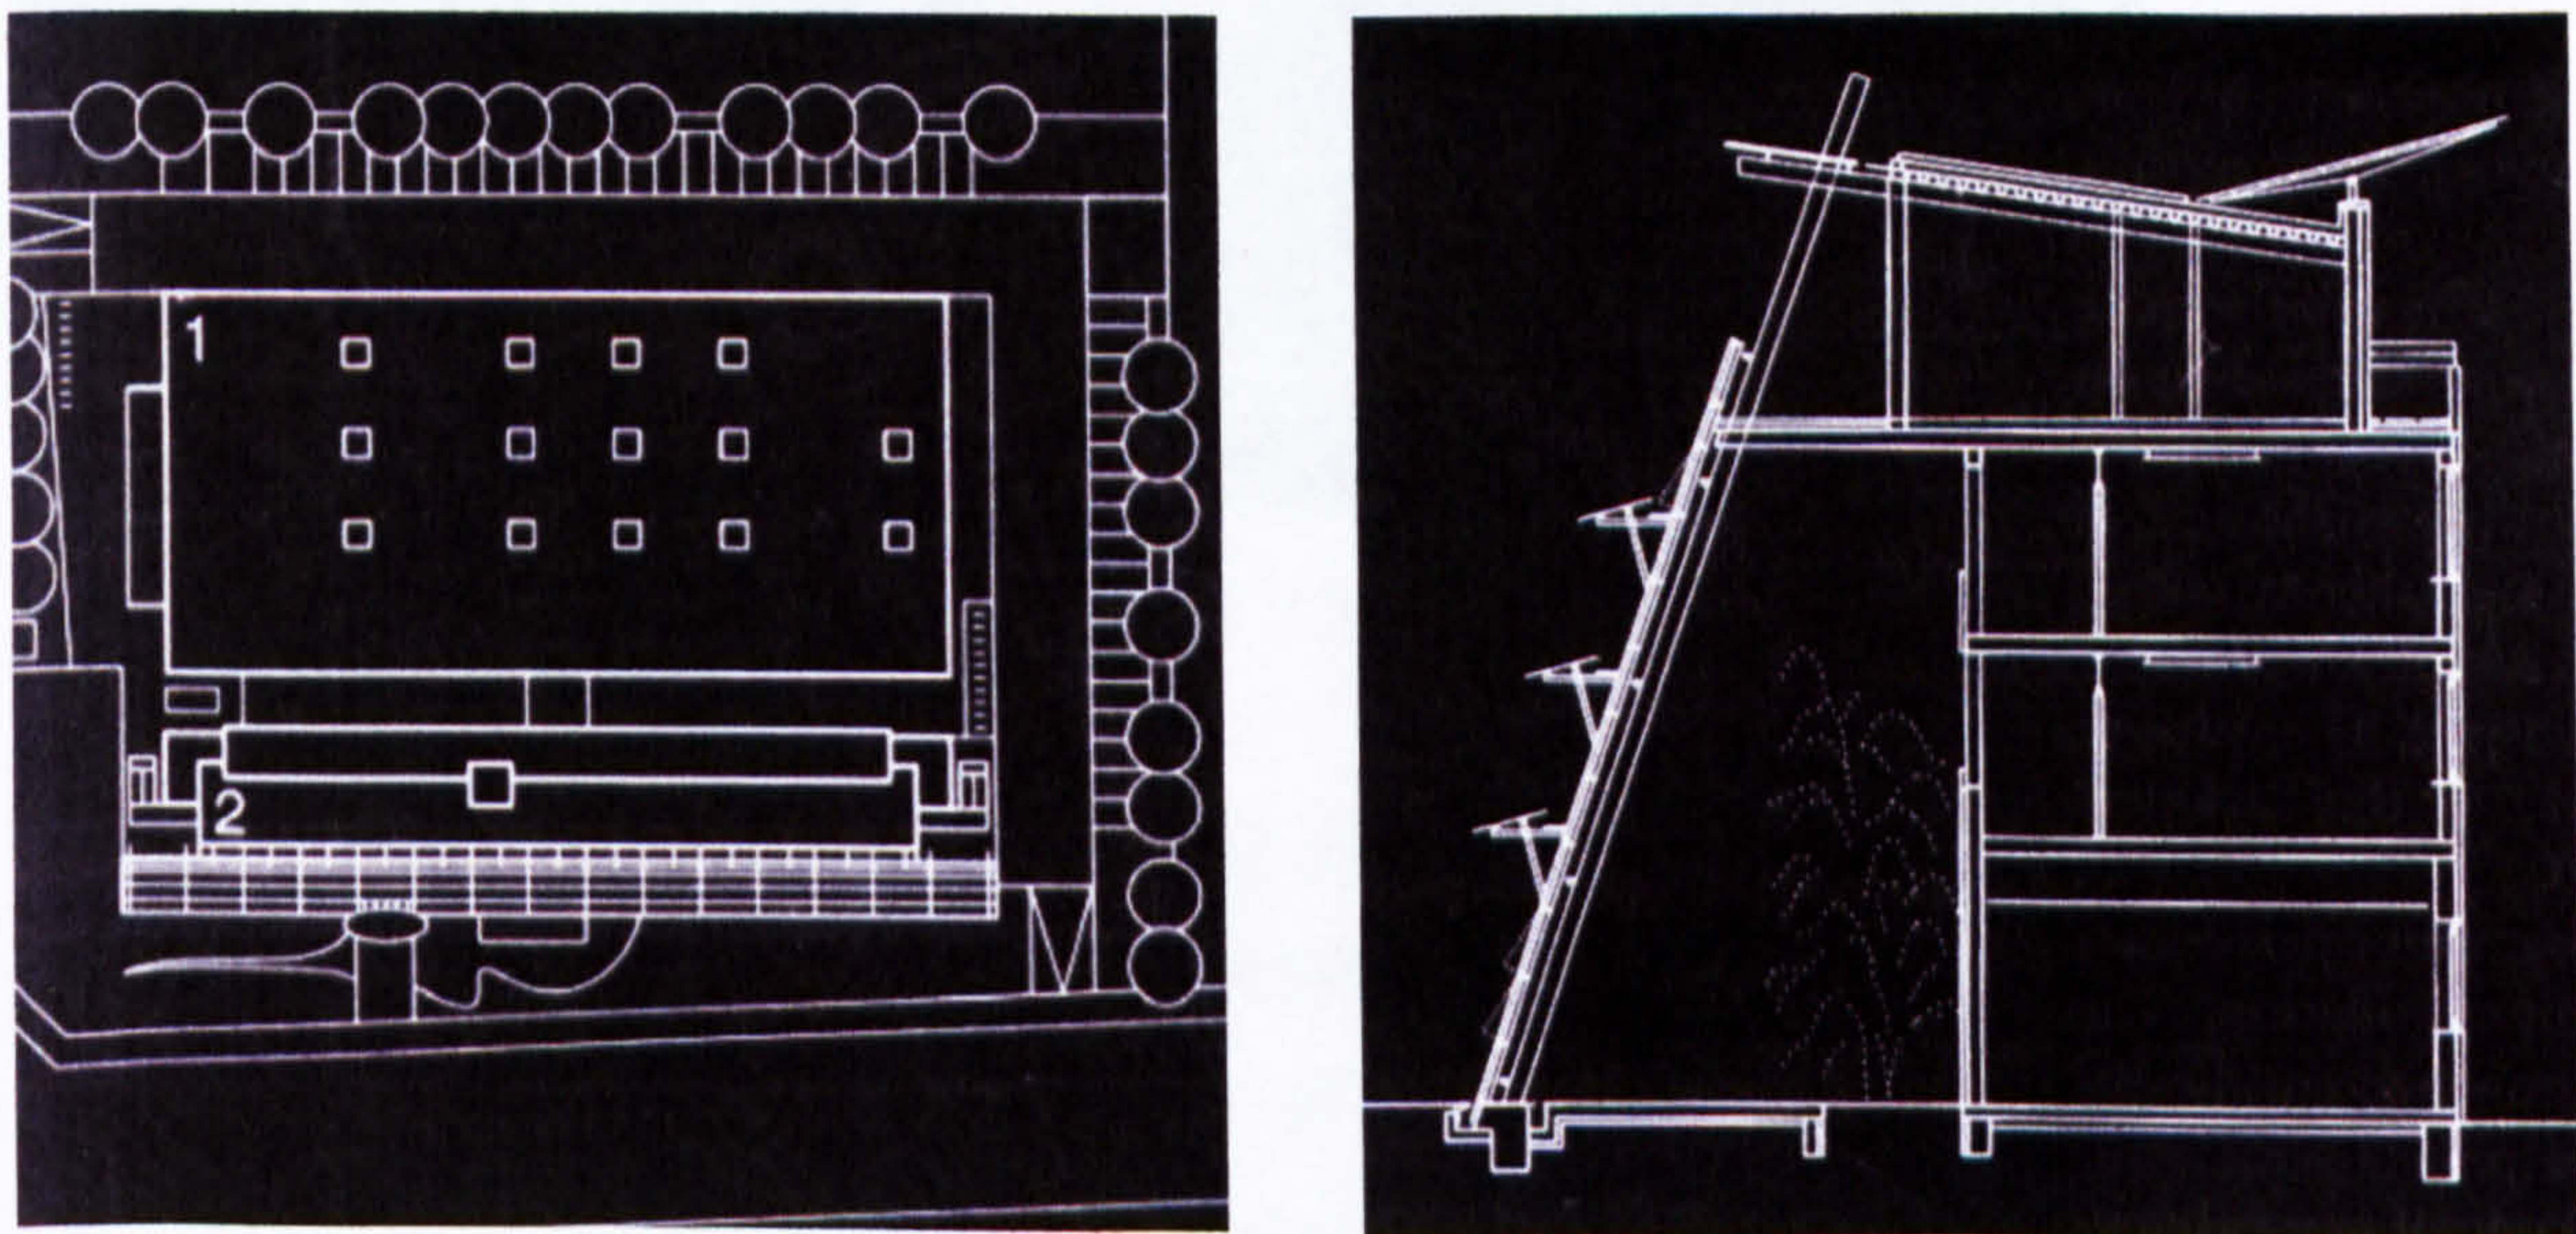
Solar Fabrik building, Freiburg, Germany. Site plan and cross section
